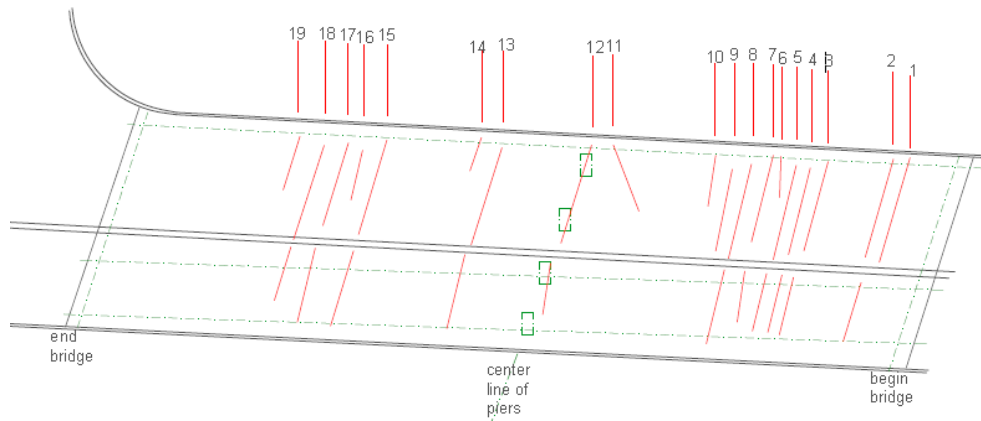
Deck and soffit cracking map (general distribution of cracks)
